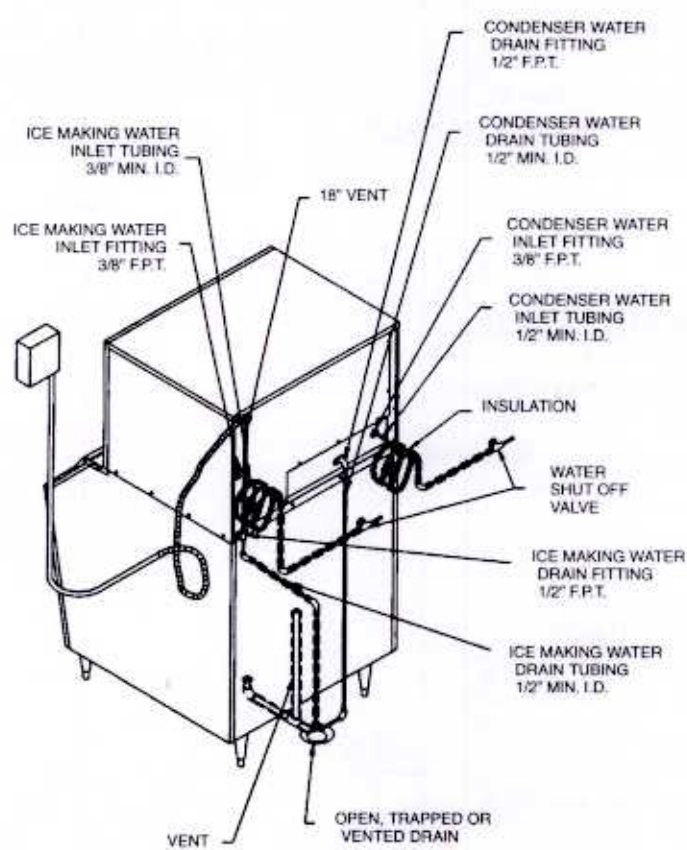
TYPICAL WATER SUPPLY DRAIN INSTALLATION (B450 SHOWN)
